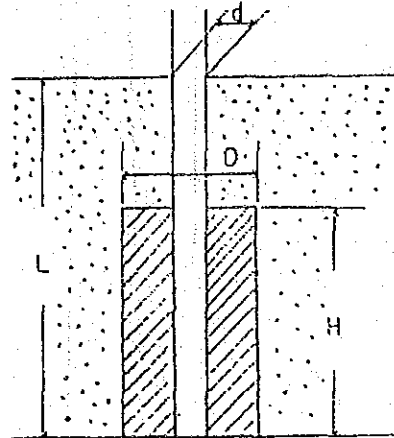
Pole Foundation Strengthening in Poor Soil
